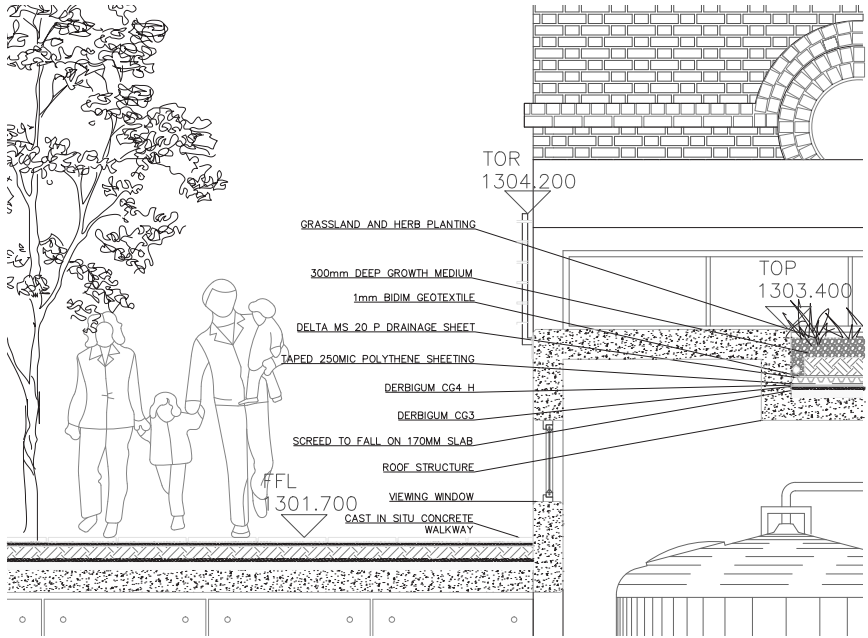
Detail 1-Section through intensive 'green' roof - not to scale (Author: 2013)
